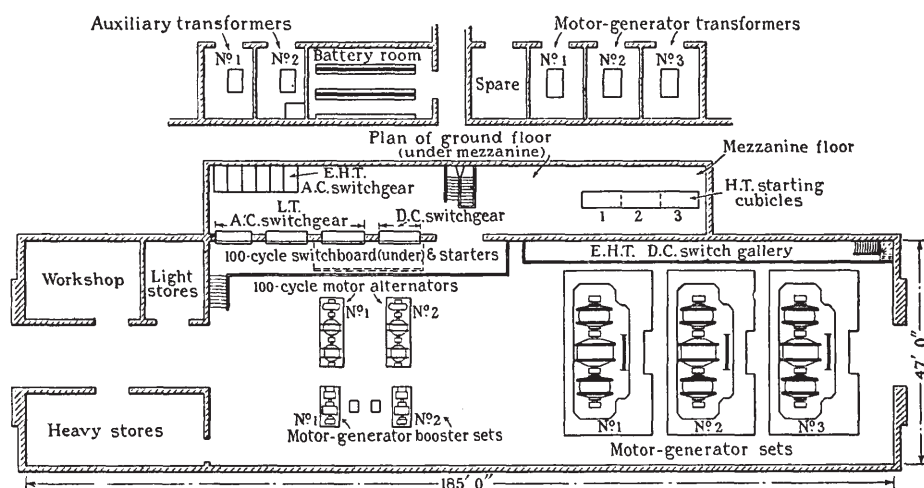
Plan of power house (scale $\frac{1}{16}$ in. = 1 foot).
